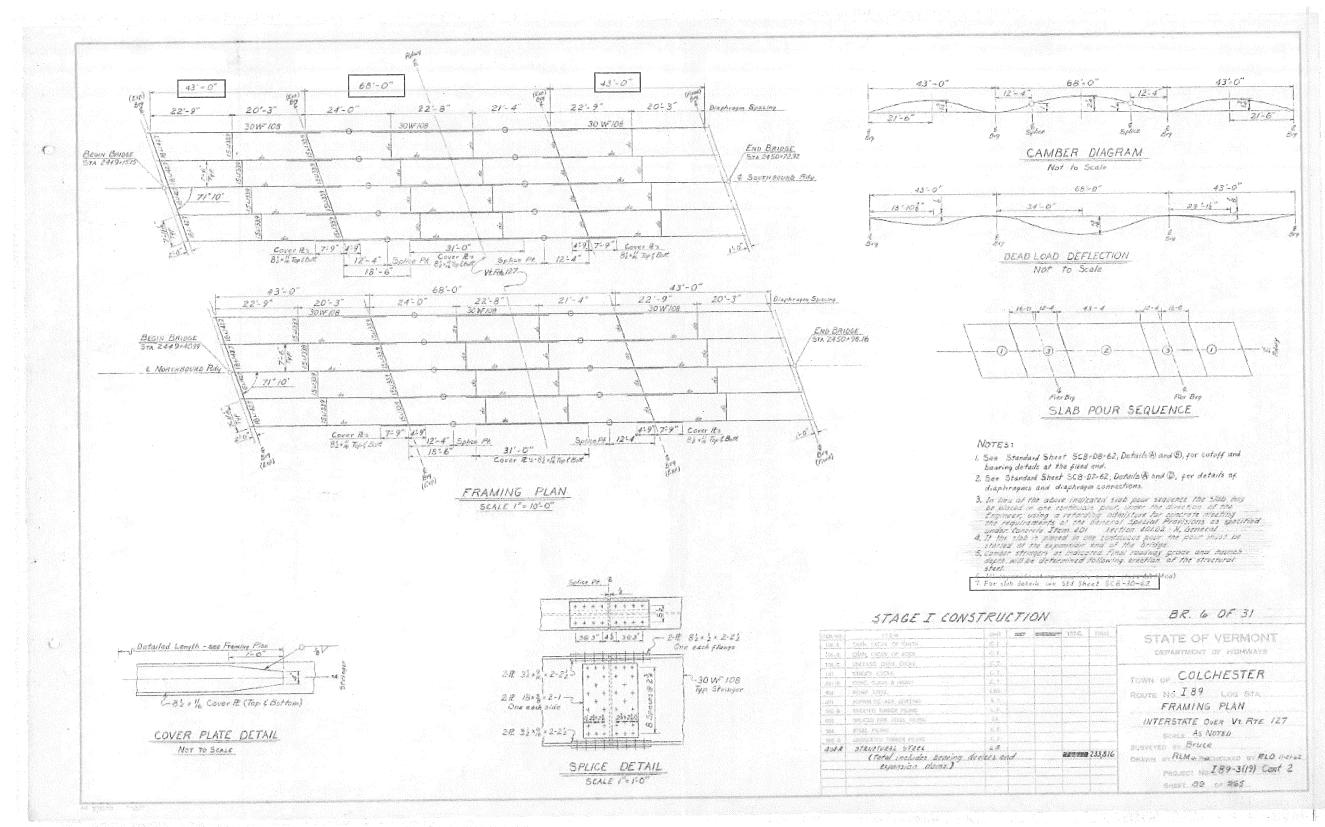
Colchester IM 089 3(69) - Bridge 76 (Page 1)
